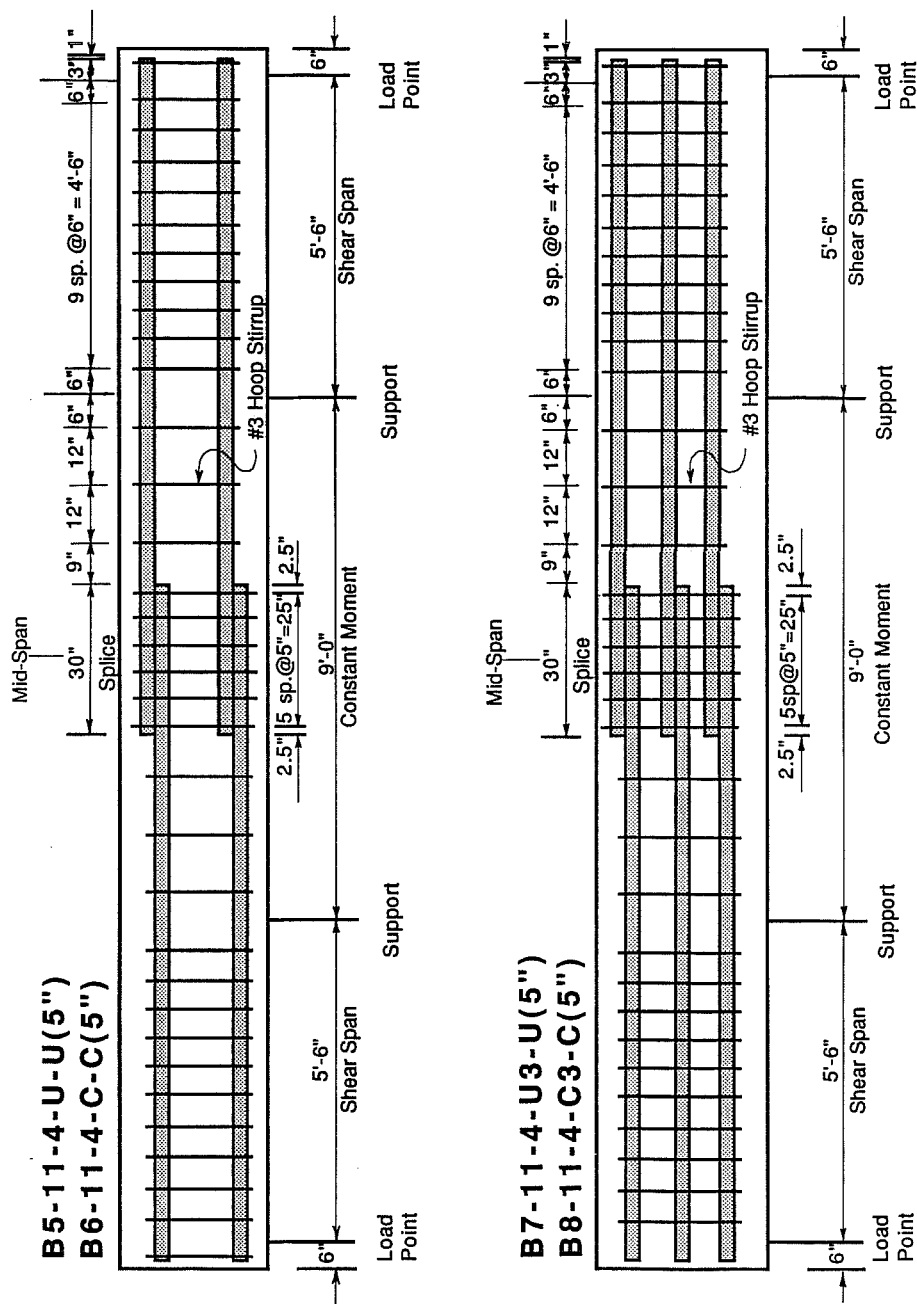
Steel layout of beams B5, B6, B7 and B8.
